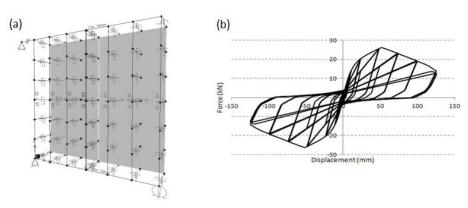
(a) Model wall with sheathing to framing nail connections in SAP2000, and (b) simulated hysteretic behaviour.
